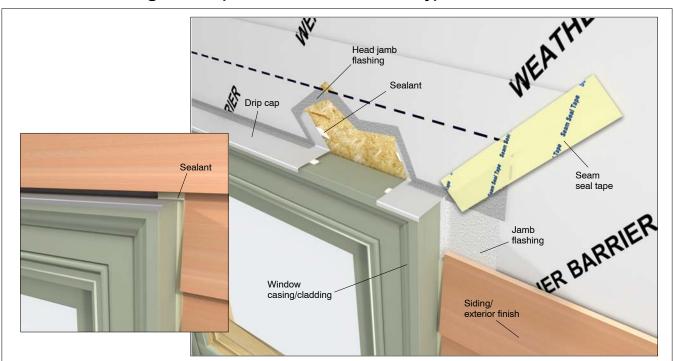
Flashing windows with casing in typical wood frame construction (non recessed masonry).
